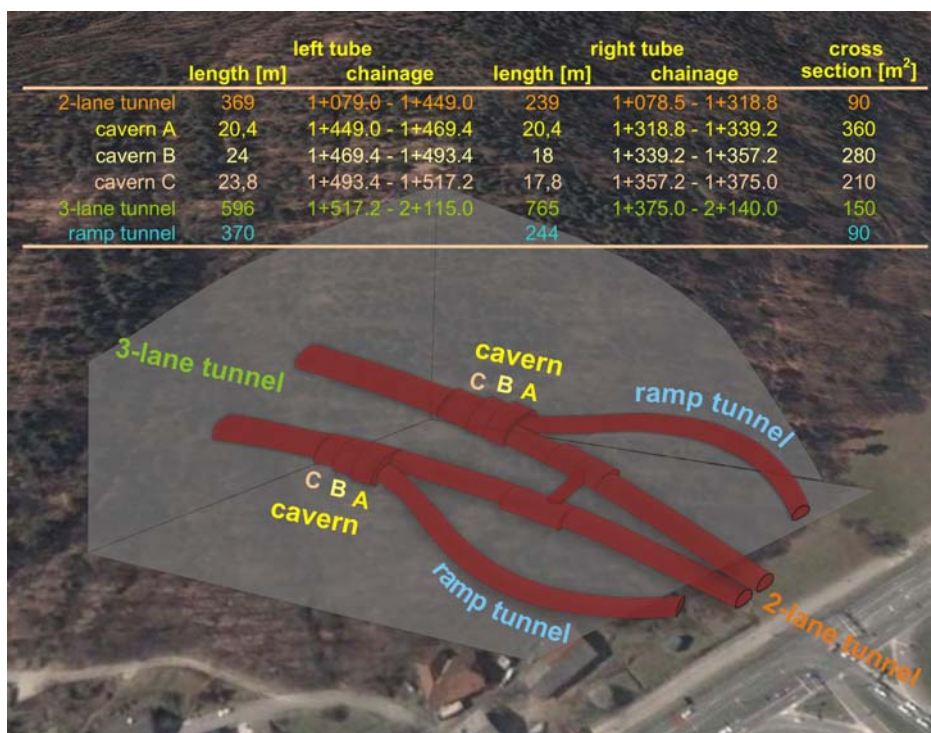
Final scheme of the underground junction of the Šentvid tunnel.
